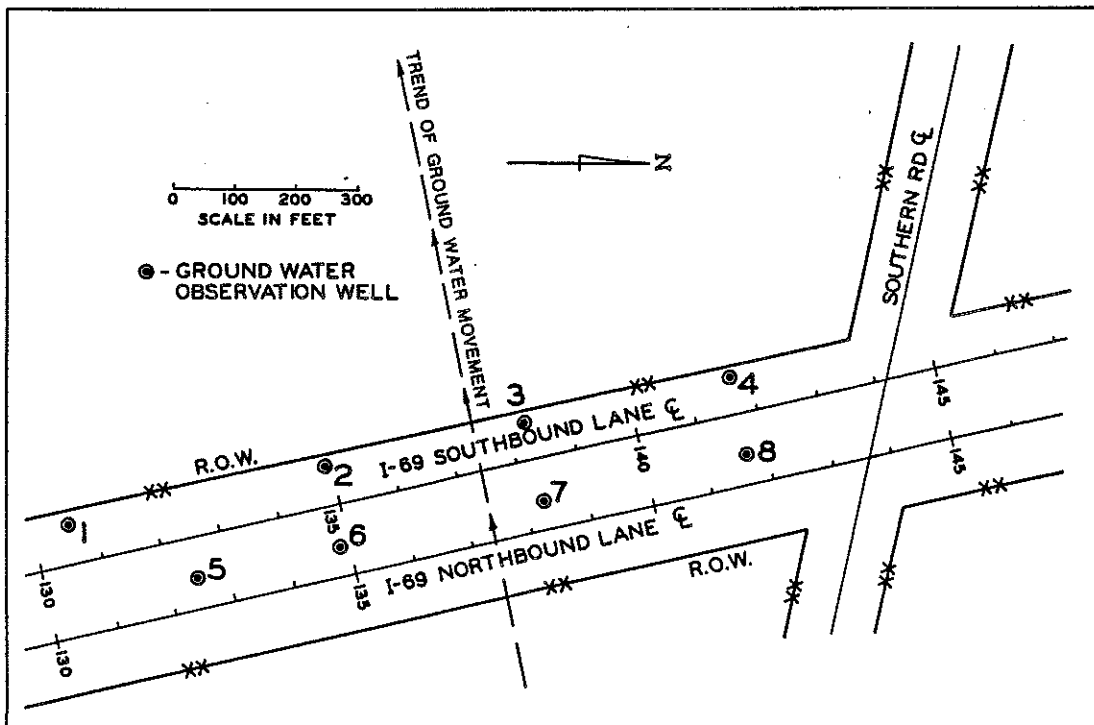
I 69 well locations: I 69, Southern Rd area (Sections 10 and 15, T8S-R6W, Kinderhook Twp, Branch Co.). Roadway opened to traffic in 1967.
